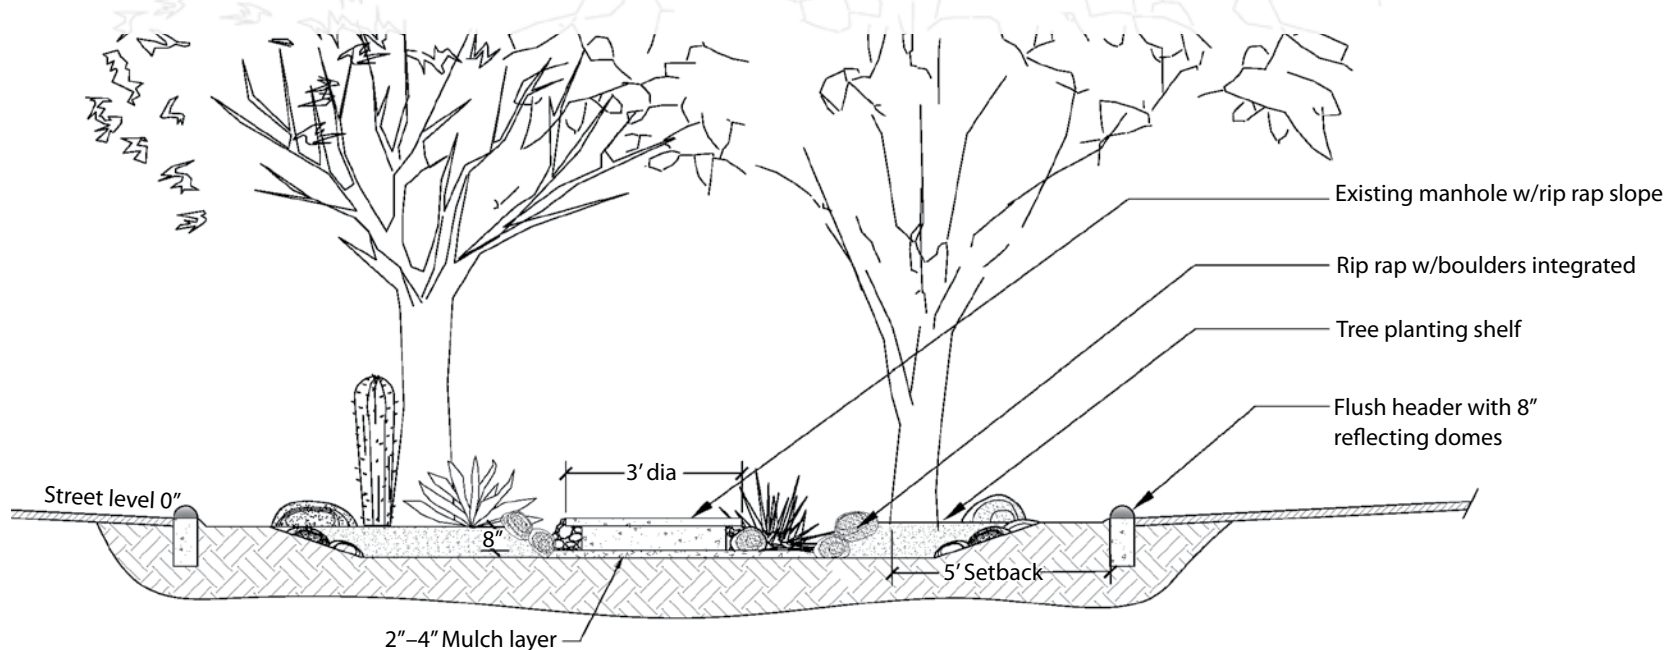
Section C. Typical cross-section of a traffic circle with flush curbs and depressed bioretention area. For plan view, see Appendix.
